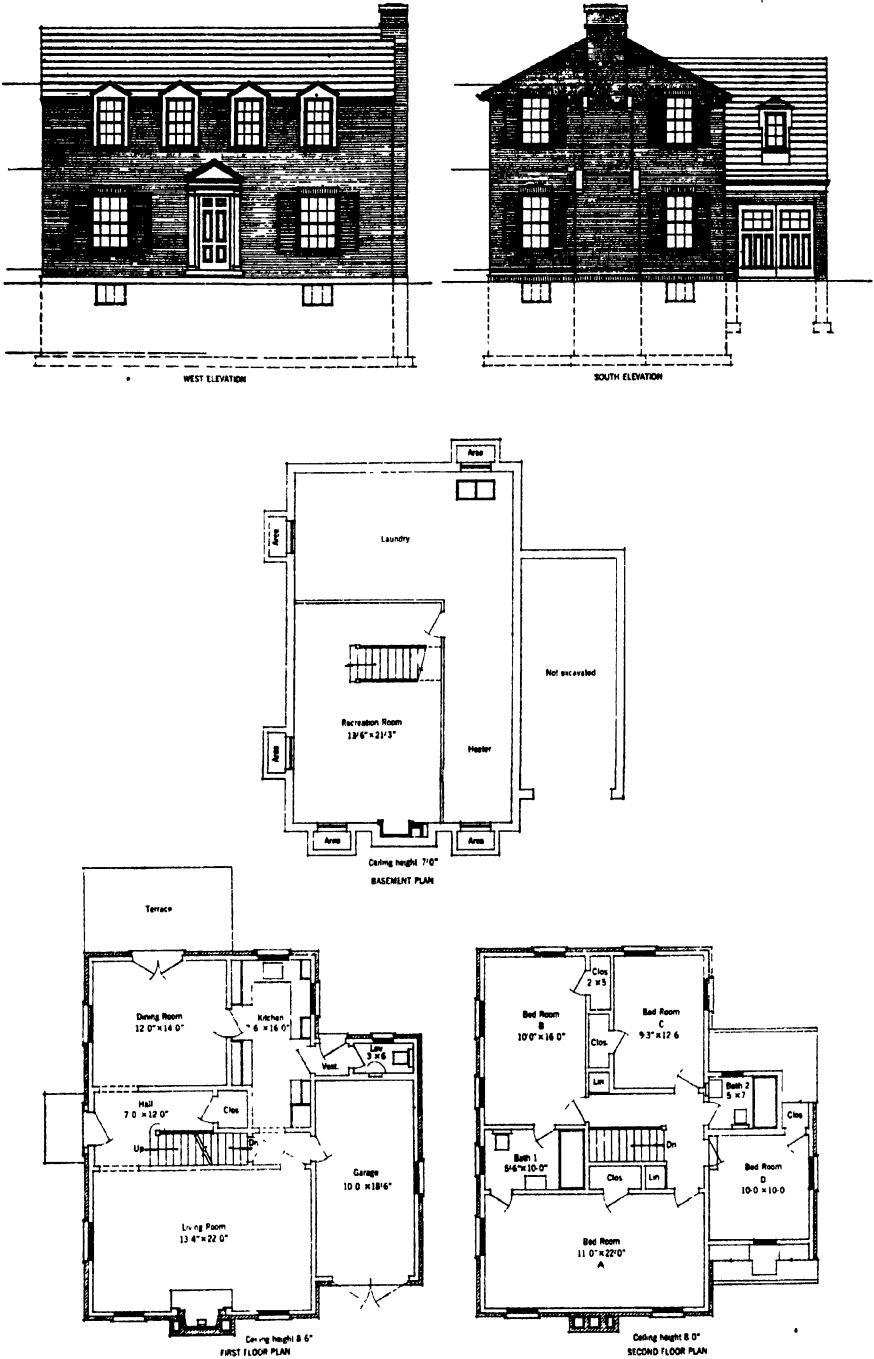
ELEVATIONS AND FLOOR PLANS OF RESIDENCE
